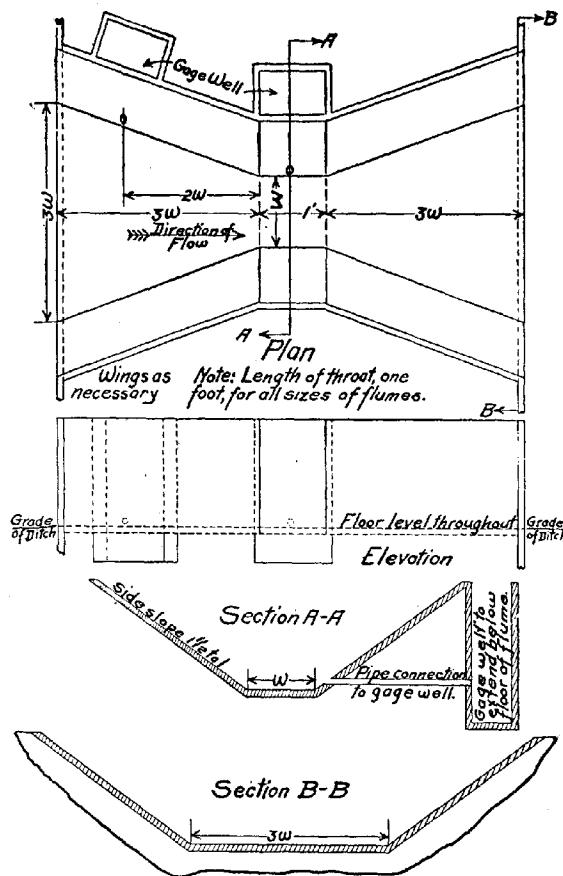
Standard plans for the Venturi flume with trapezoidal cross section.
